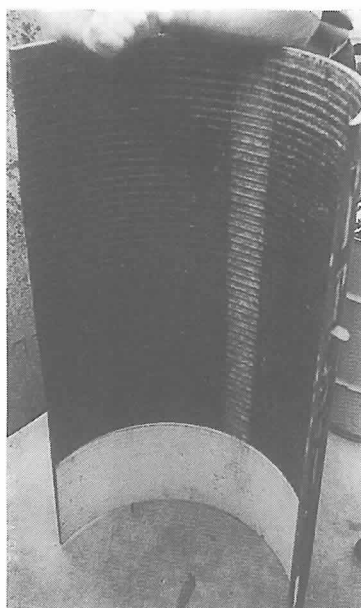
Shape of carbon fiber shell used to reinforce concrete pier
